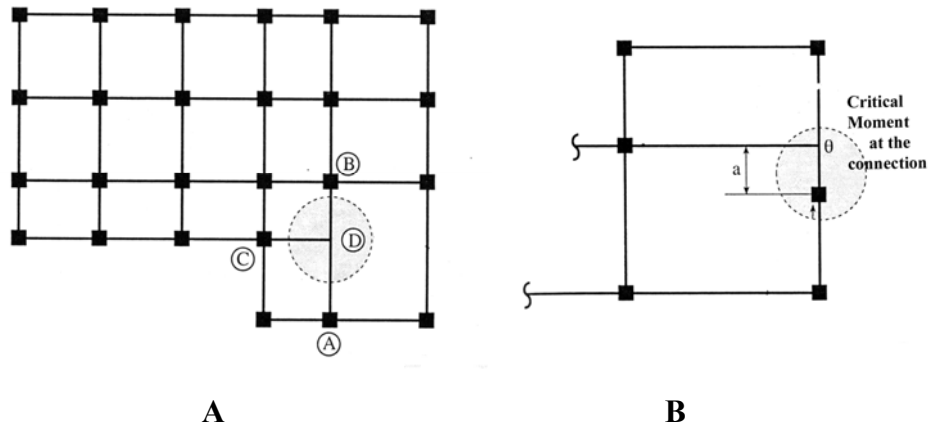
Beams Intersecting Without Vertical Support¹³²
